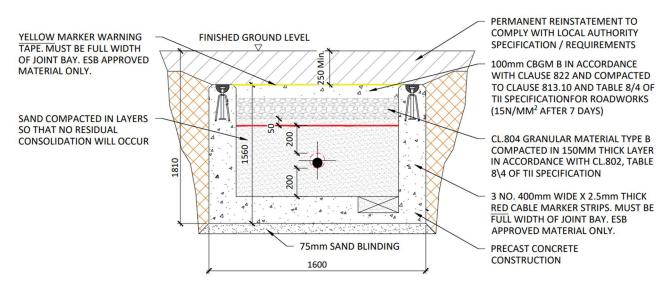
Typical Elevation of Joint Bay installed in Roadway
